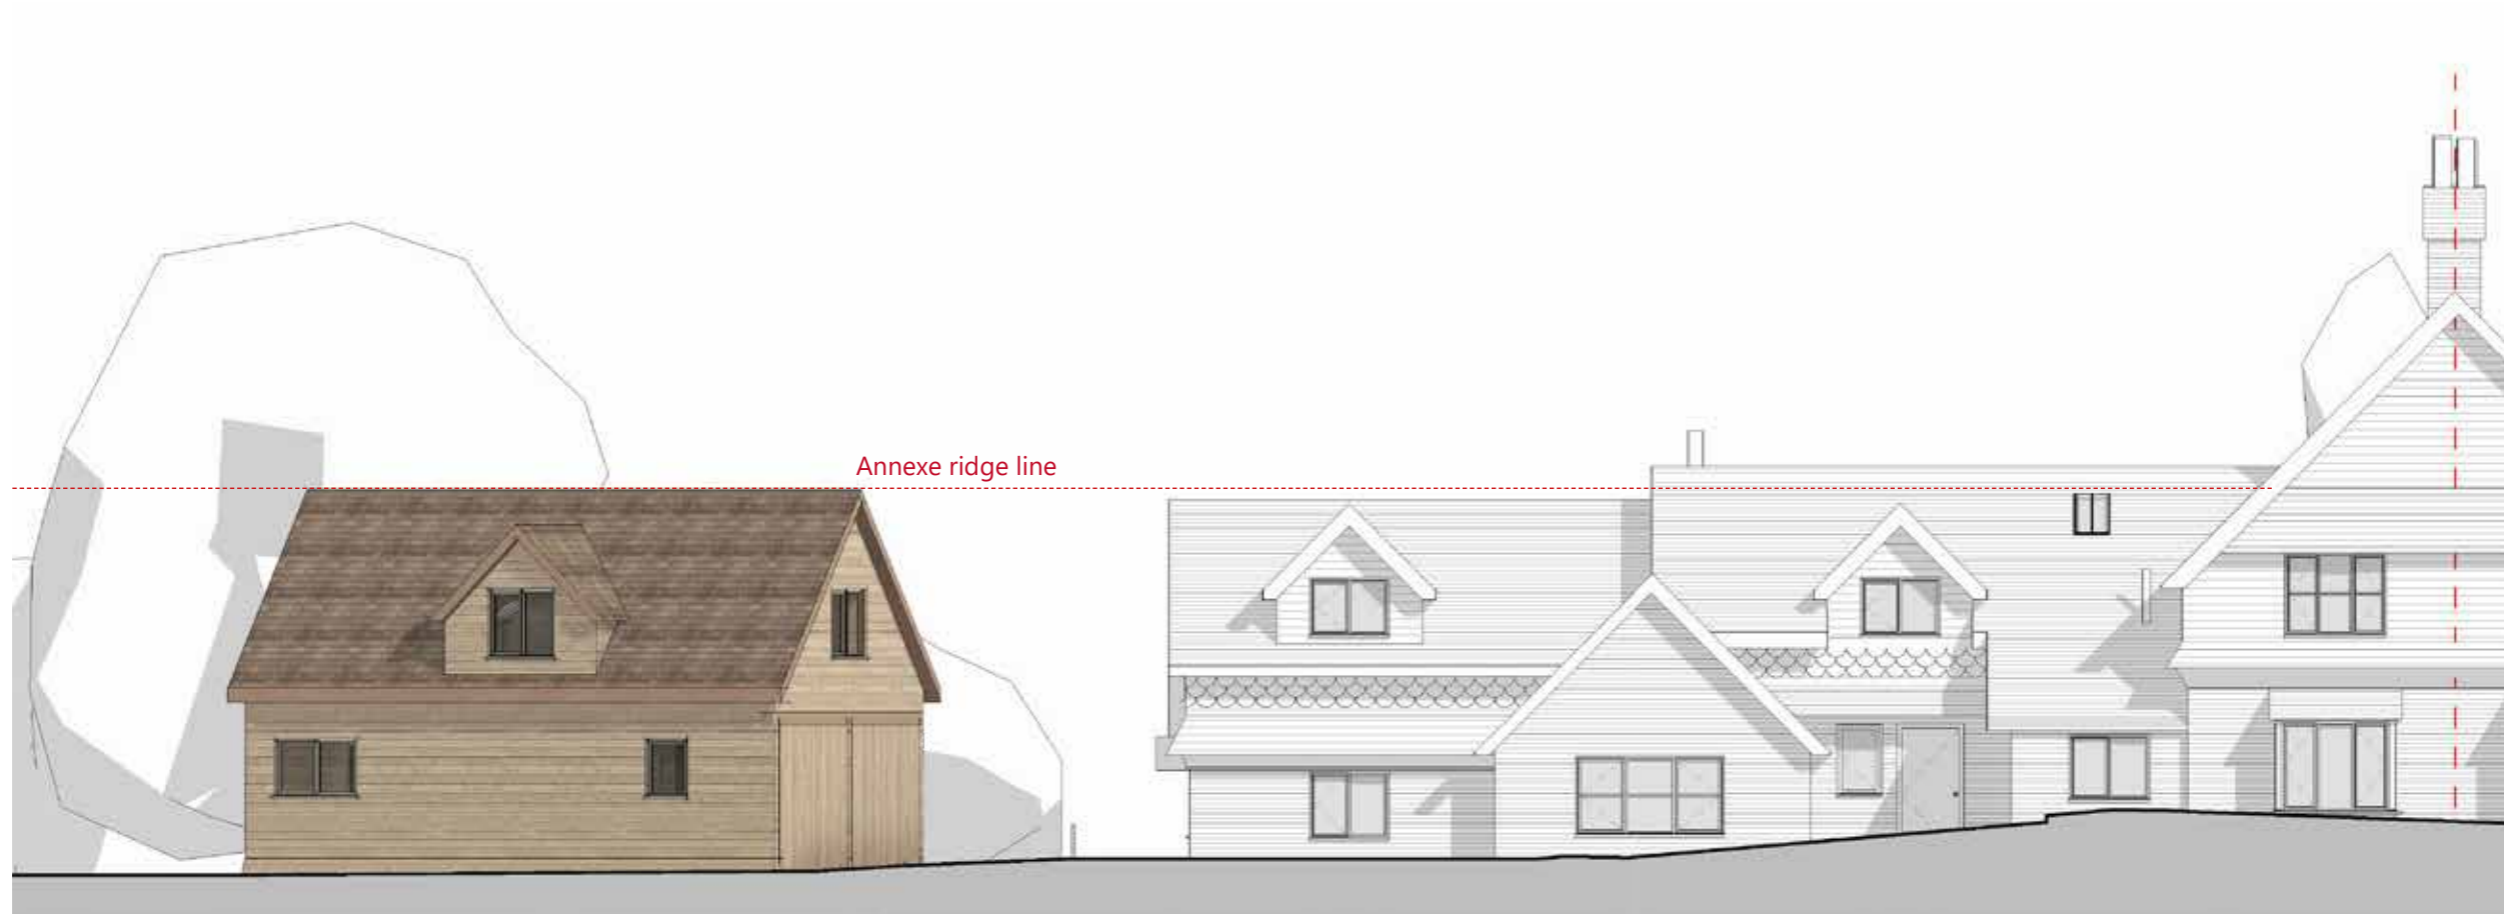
Site proposed front elevation, showing how ridge of annexe will be subservient to ridge height of existing main house (NTS)
